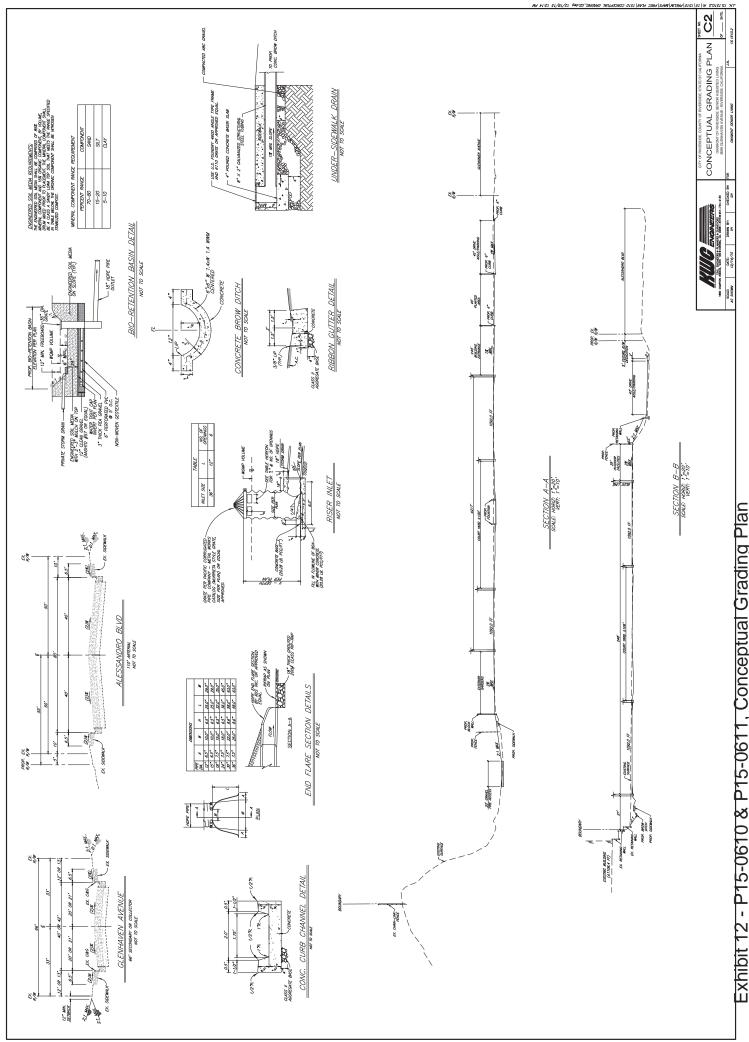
P15-0610 & P15-0611, Conceptual Grading Plan
